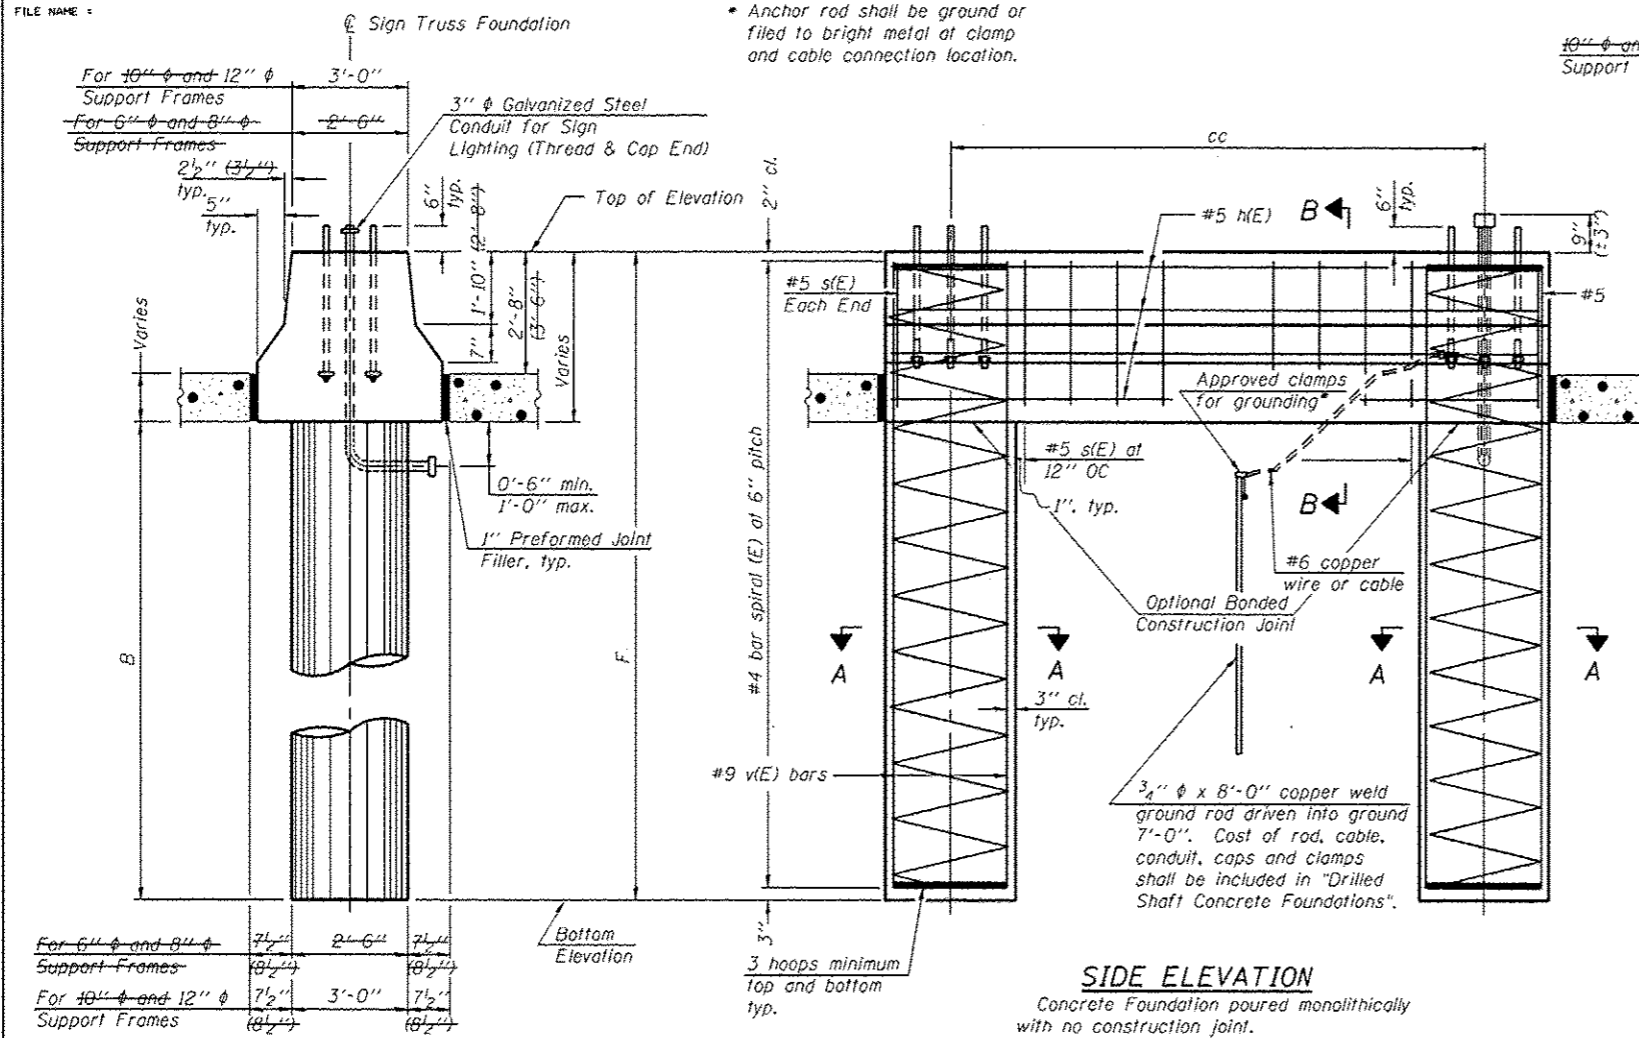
" φ SUPPORT FRAME TYPE III-A TRUSS
